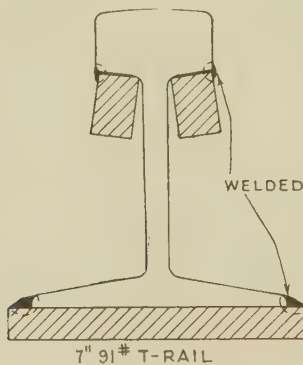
Base-plate type arc-welded rail joint.
